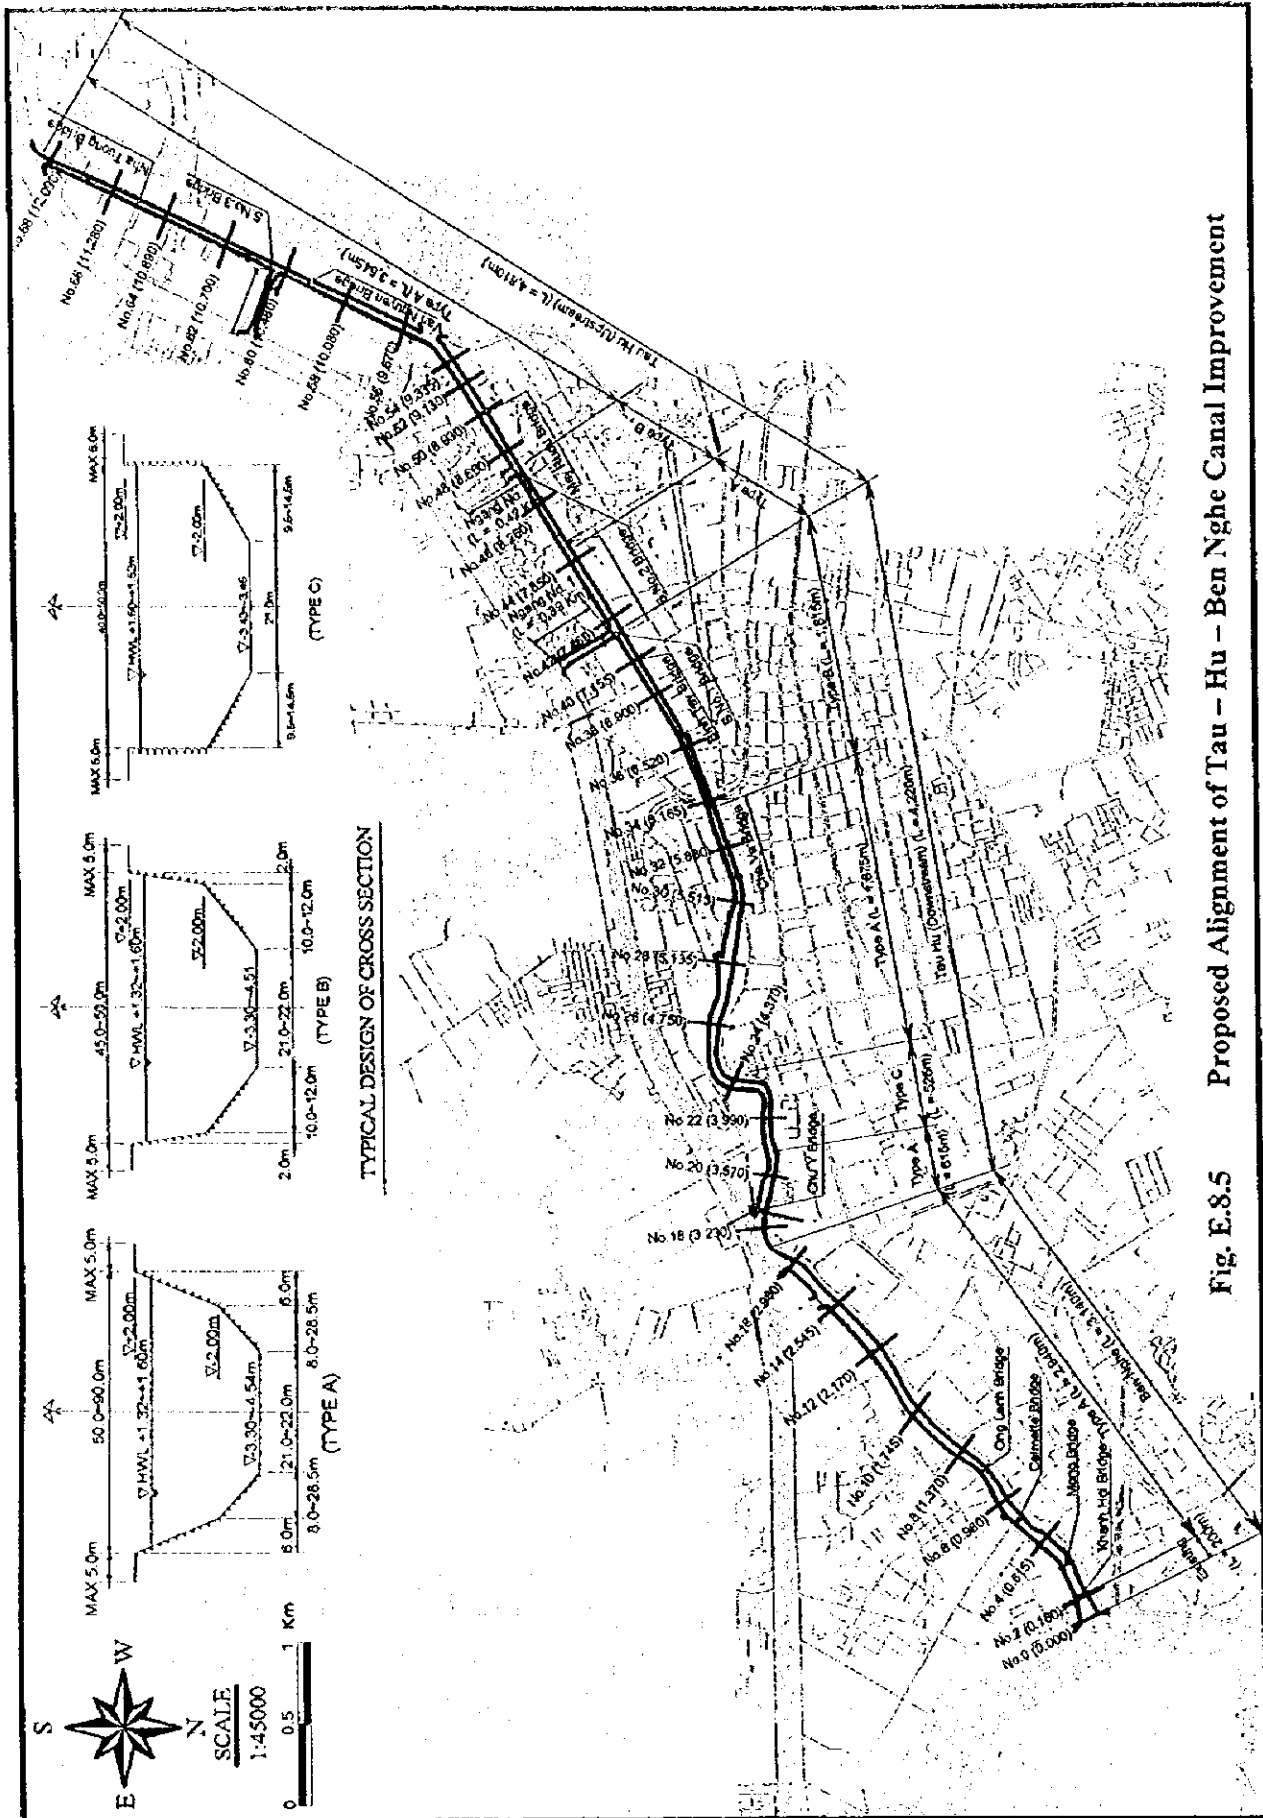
Proposed Alignment of Tau - Hu - Ben Nghe Canal Improvement
